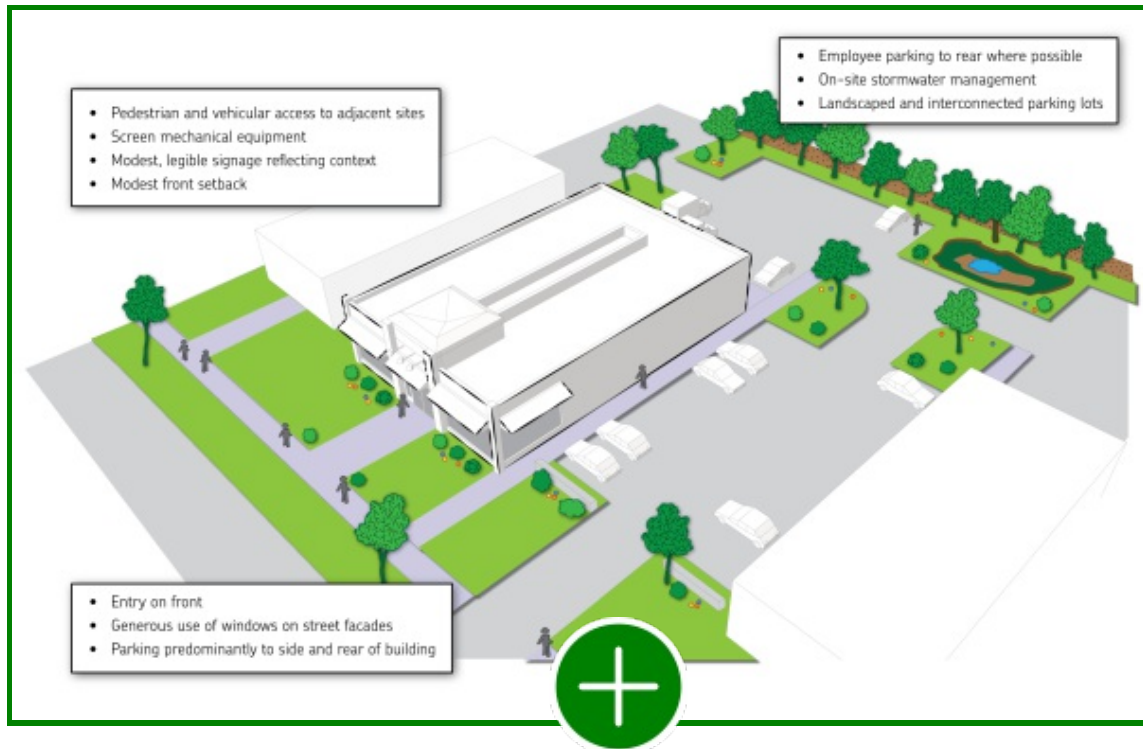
(3): ~~N-District~~ Architectural Requirements, ~~Neighborhood~~ Business Uses and Mixed Use Buildings
